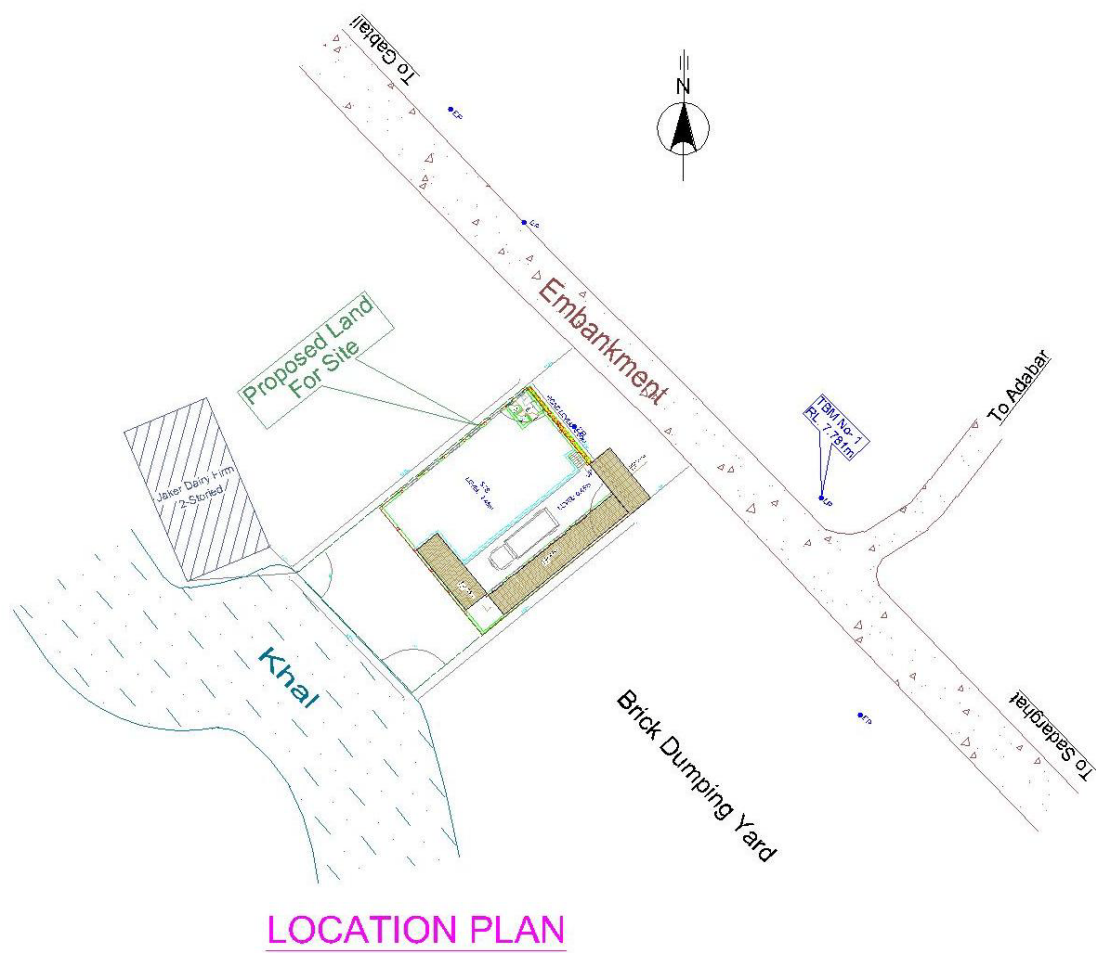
STS – 5 Berry Bandh Mohammadpur Layout Plan (23°45'34"N, 90°21'10"E)
